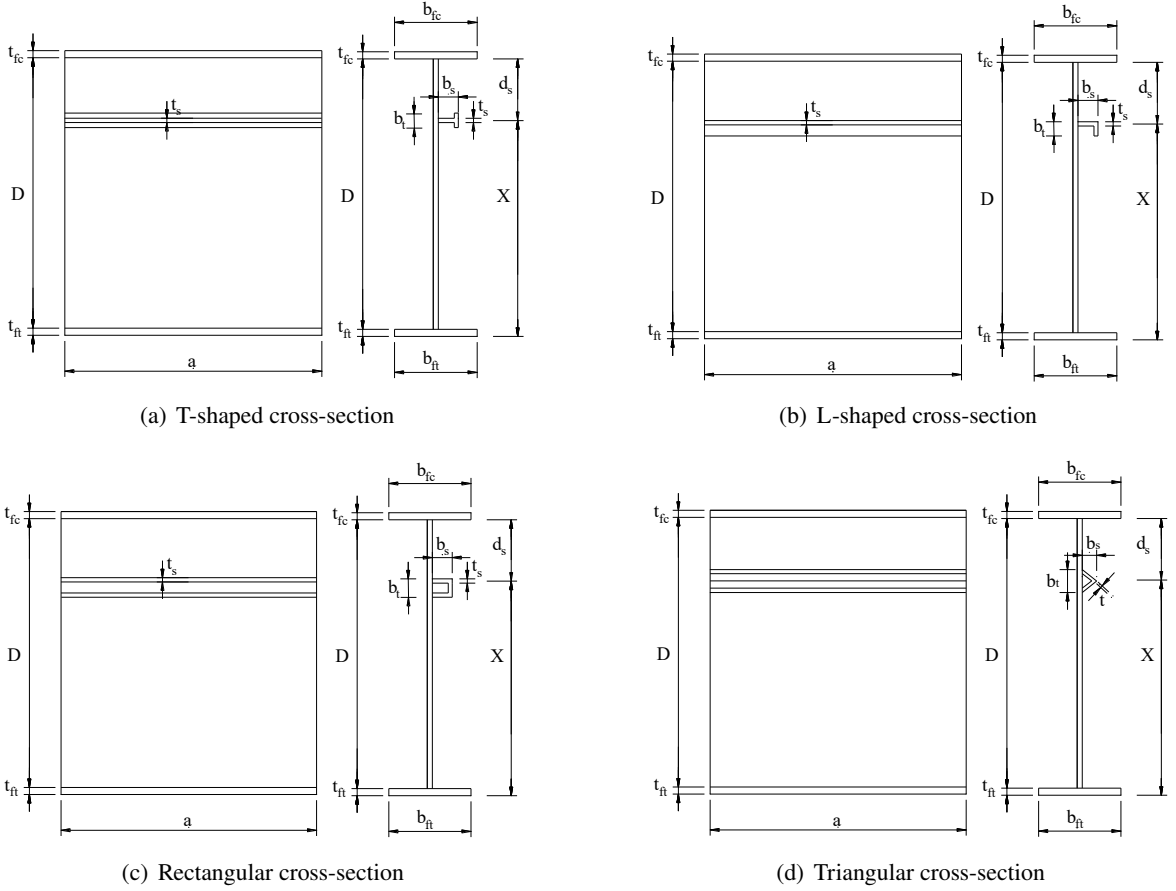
Geometry of longitudinally stiffened plate girders having various stiffener cross-section types
